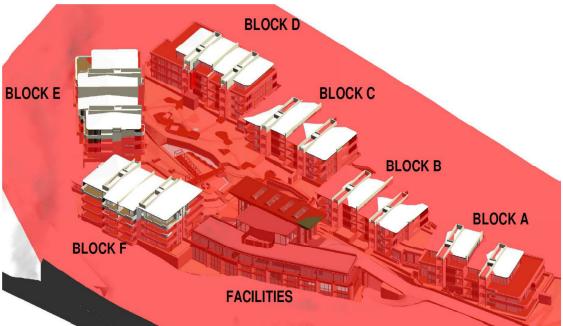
The proposed 8.5m building height plane (source: Adapted by the author from Plans, prepared by Marchese Partners)
